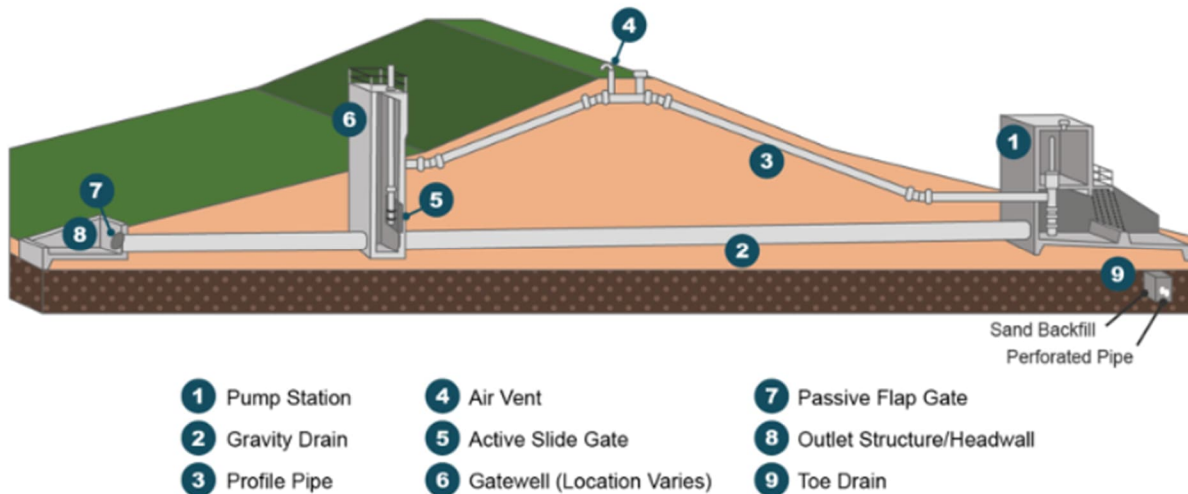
From Draft National Levee Safety Guidelines 2: Understanding Levee Fundamentals – Typical Drainage Structure Penetration through Levee Embankment
